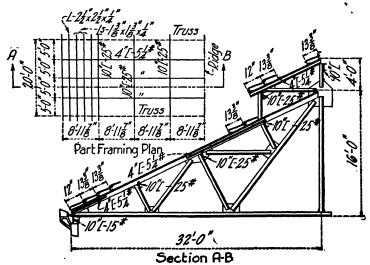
Details of a Roof Covered with Ludowici Tile.
